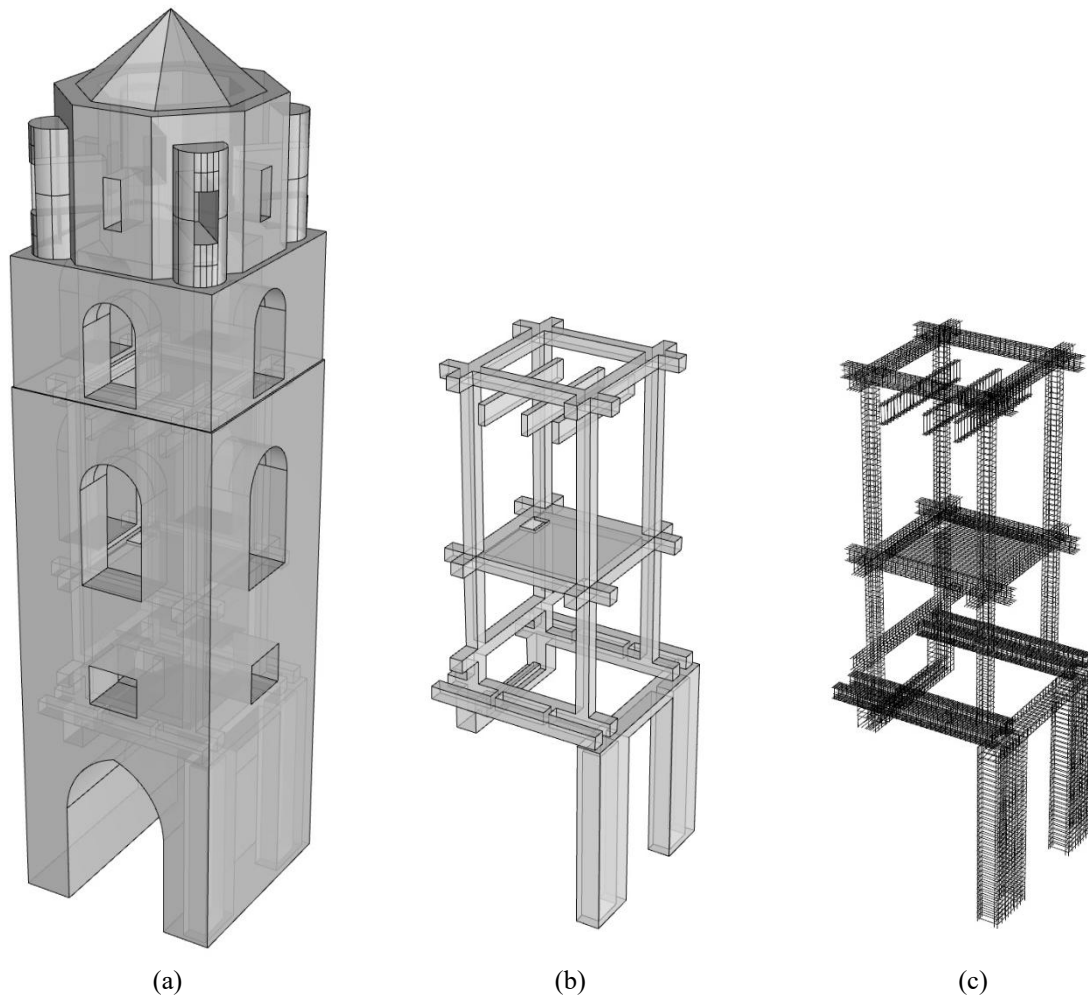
The adopted geometrical model: (a) masonry portion, (b) concrete frame and (c) rebars in concrete frame.
